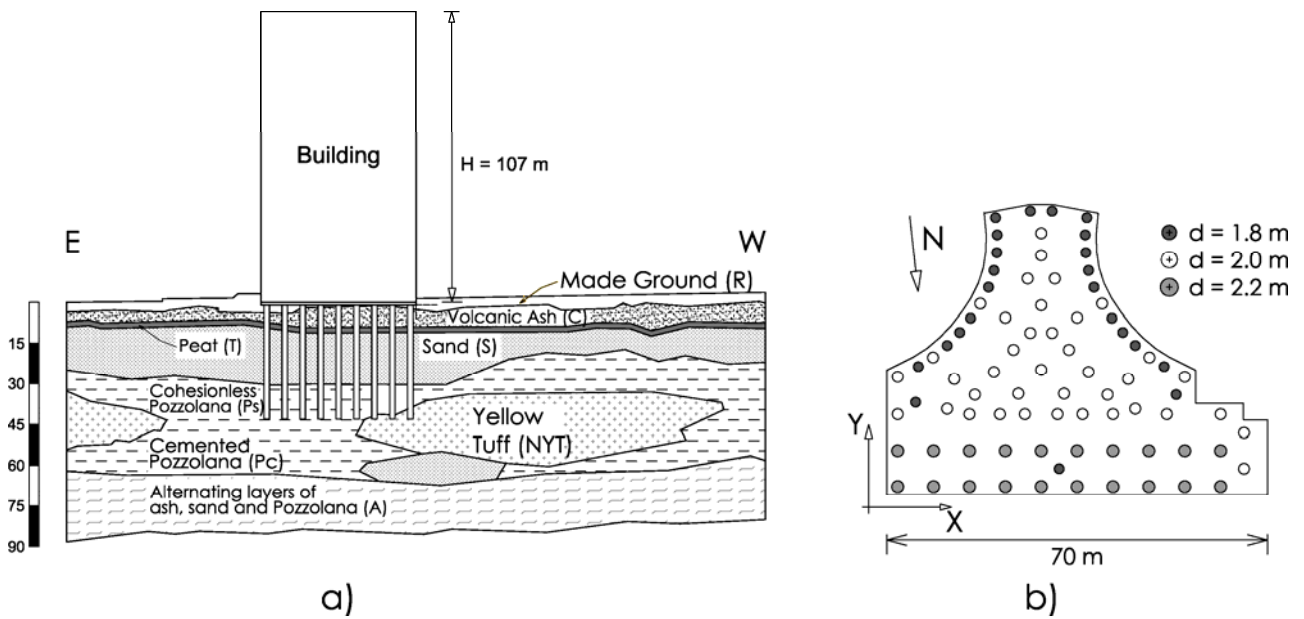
Cross section (a) and plan view (b) of the New Law Court Building in Napoli
